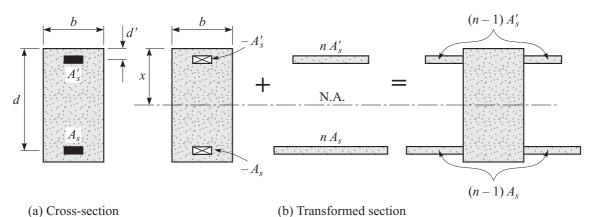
Cracked transformed rectangular section with compression reinforcement.
